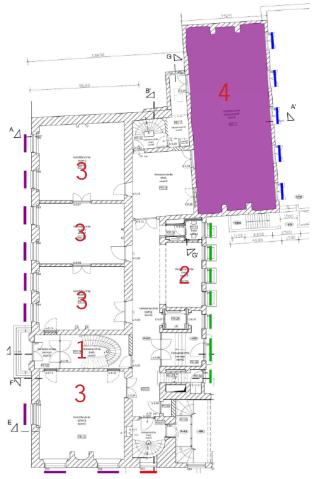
Ground floor with measures (Source: NIBE, 2008)
